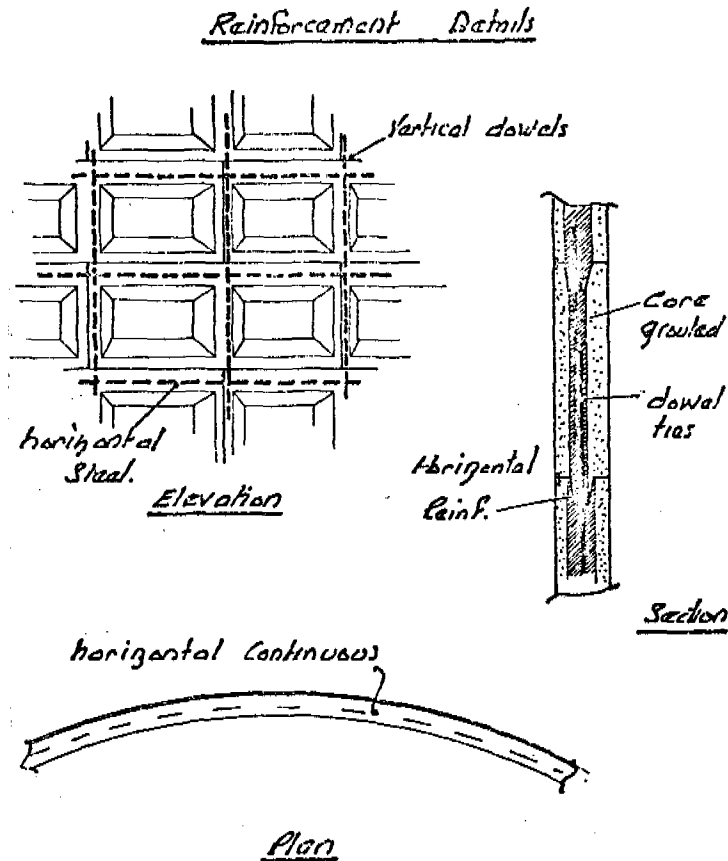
shows the general construction of an INKA tank built as a single wall applicable in the diameter range of 4 metres to 18 metres. Figure 4 describes the layout and location of the reinforcement which is applied on site in the form of horizontal circular tension reinforcement and vertical dowel location reinforcement. As described, each element has a top level groove to allow the placing and location of the hoop tension reinforcement as a continuous spiral in one plane around the tank, grouted into position on site as each element lift occurs. The vertical groove in the element end corresponds to a central core hole in the centre of each element, as described in figure 1, such that the vertical dowel reinforcement may be passed continuously through each element lift, tying
